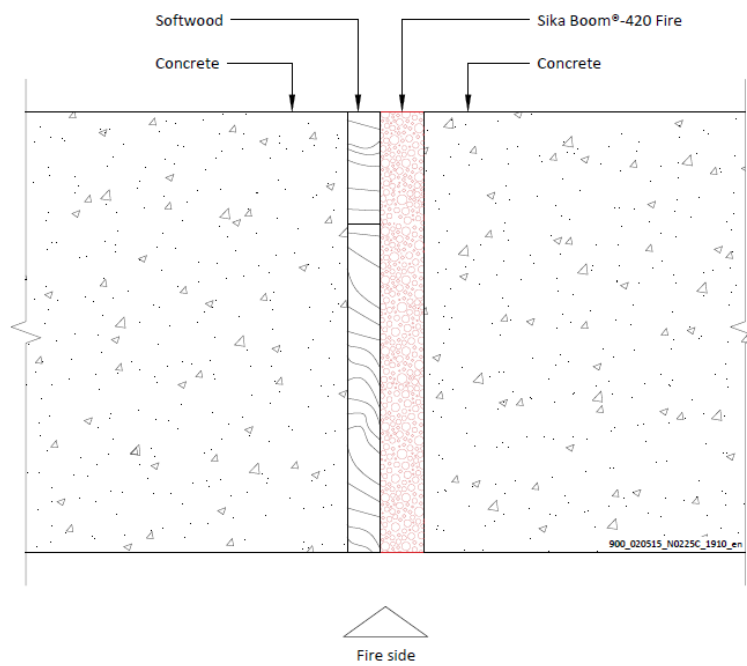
Installation on concrete floor 200mm thick with 15mm softwood insert at one side
